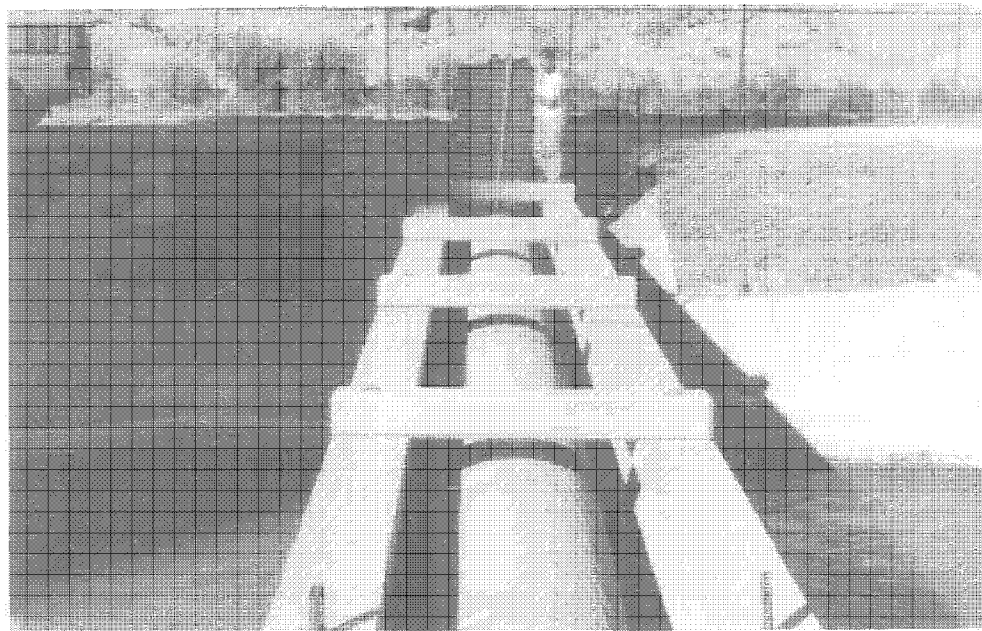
Gauging Station and Utility Crossing Above Closed Conduit "A" Looking North (1999).
